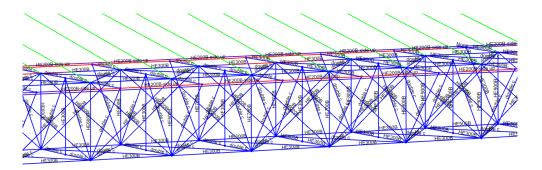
Rounding up the vertical side beams to 3 sections: HEB300-HEB600-HEB900
